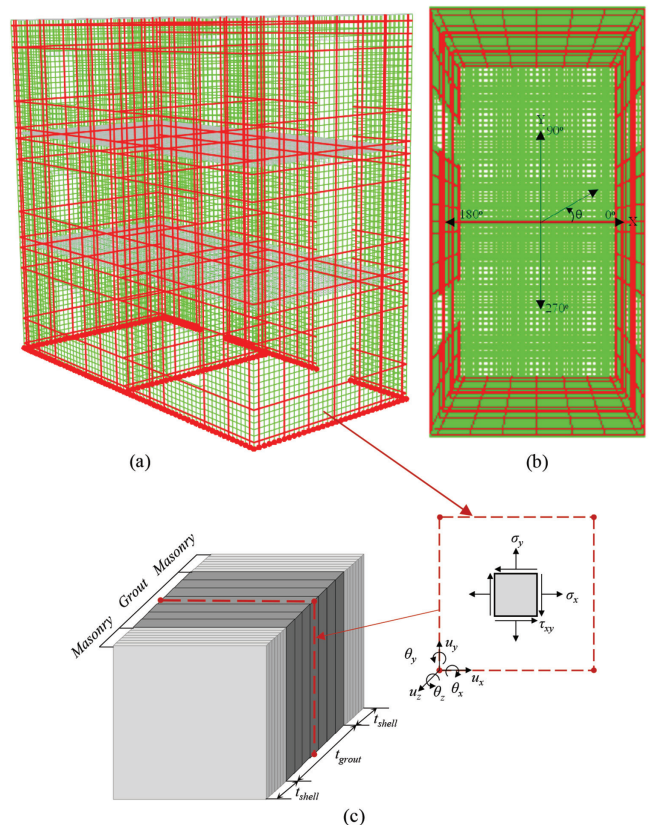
Finite element mesh: (a) 3-D view; (b) loading direction; and (c) layered shell formulation for one grouted masonry element.
